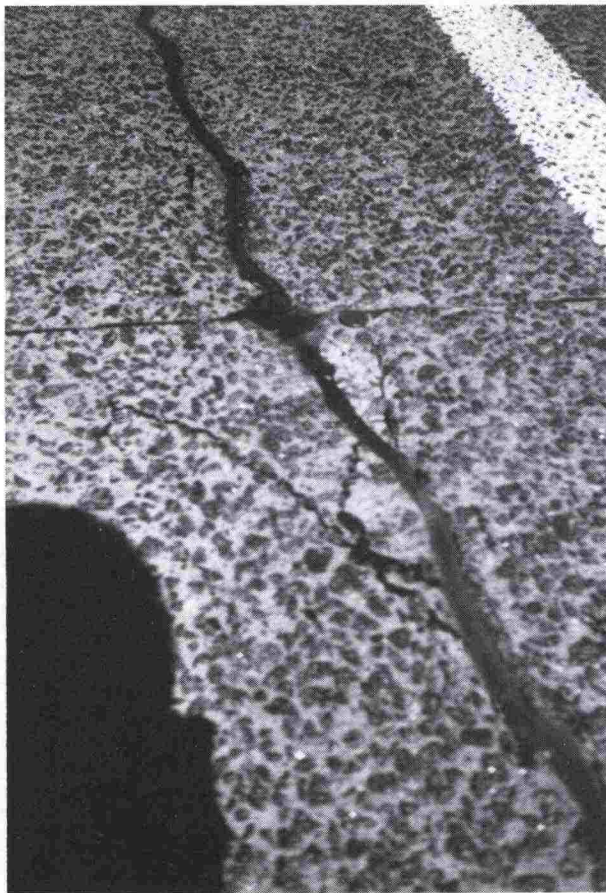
A repaired wild joint, spalling on the slab (Denmark 1988)
